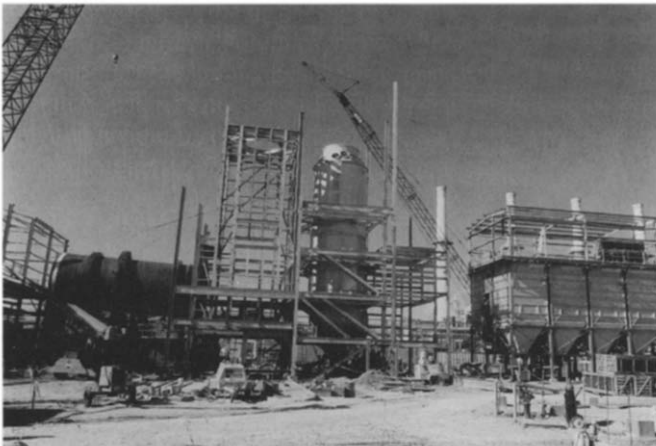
Construction state of kiln, afterburner, quench tower and baghouse section (February 1989).
